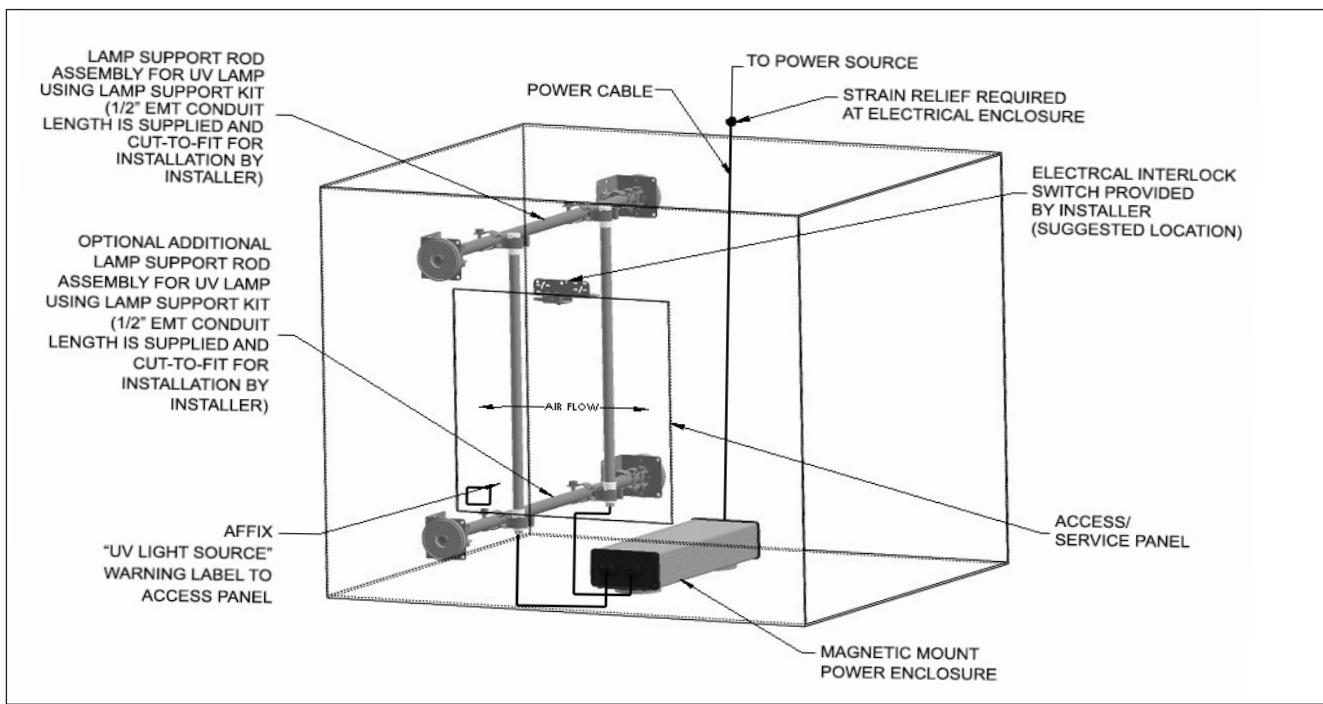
Generic HVAC Ducted Installation (H Style Rod Configuration requires rotated end mounted conduit brackets and rotated U-Shaped lamp support brackets).
